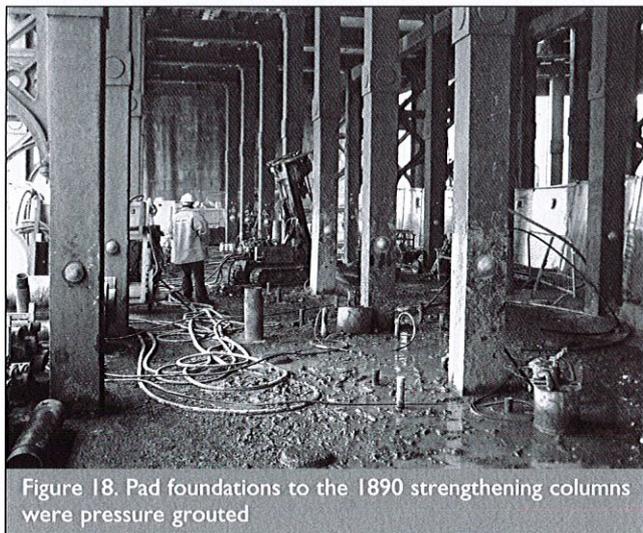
Pad foundations to the 1890 strengthening columns were pressure grouted
